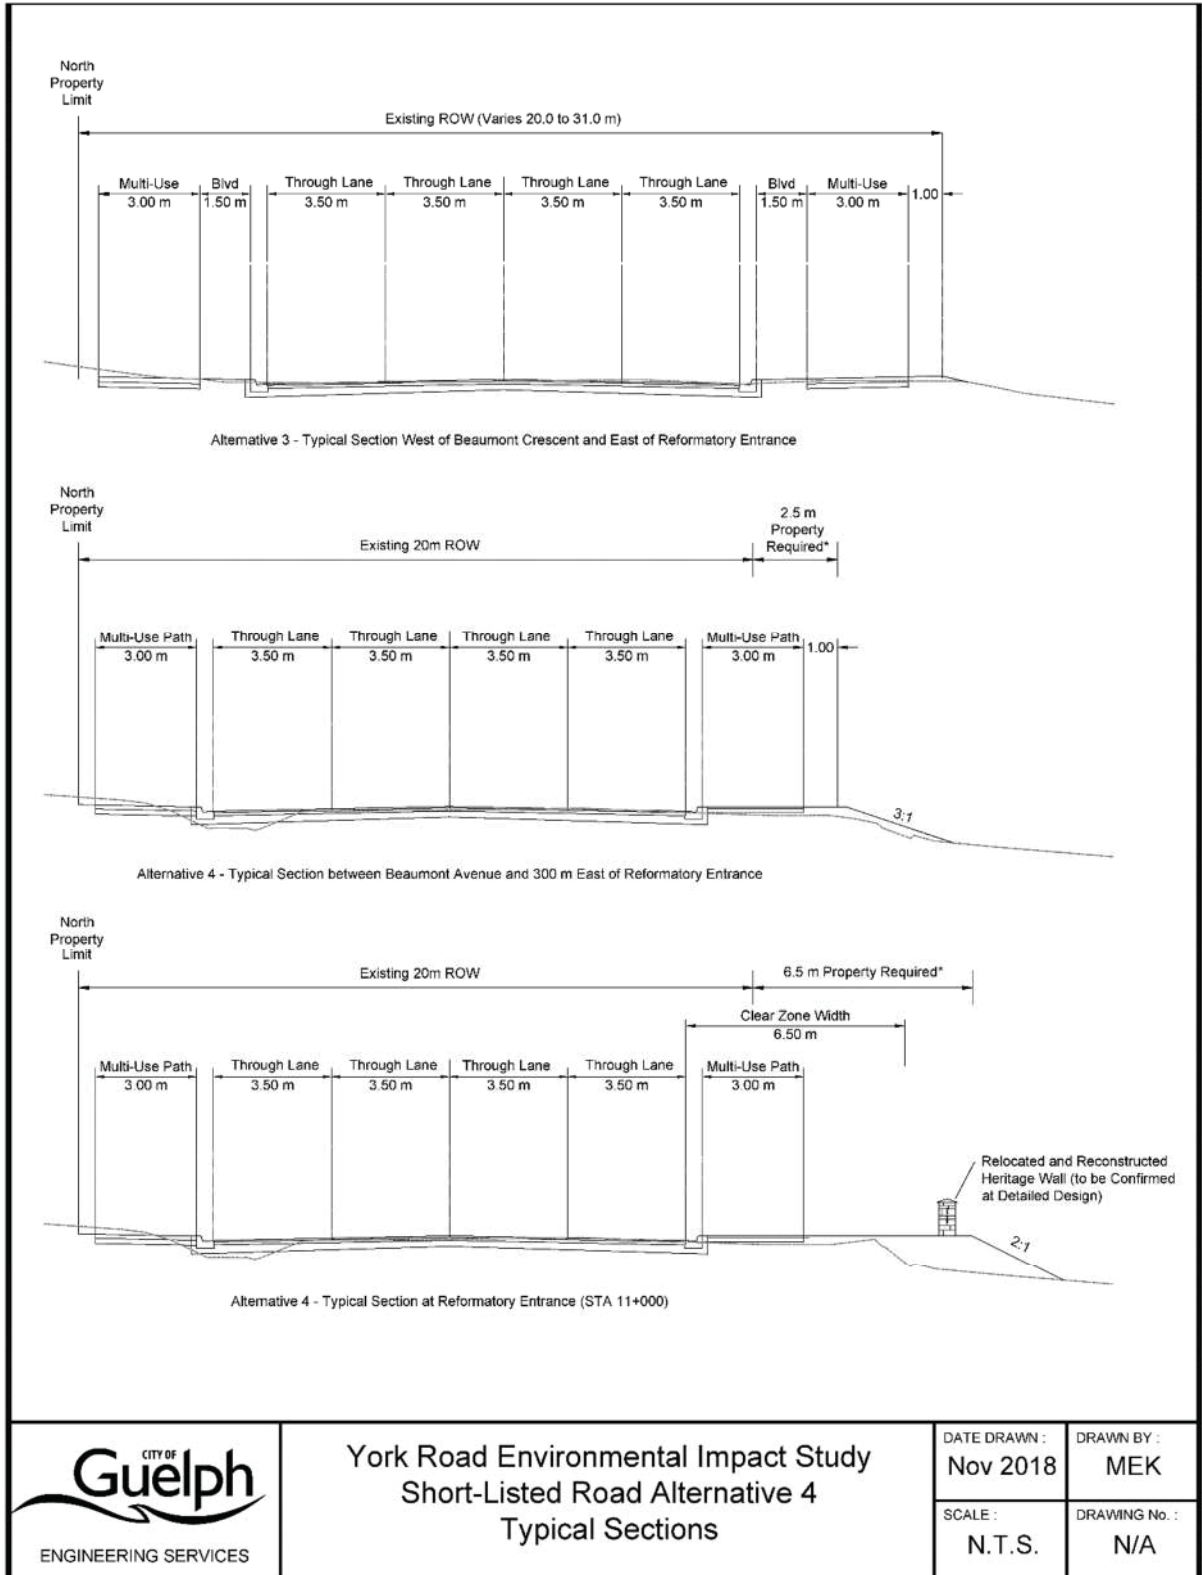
Typical Roadway Cross-Section for York Road Alternative 4.
